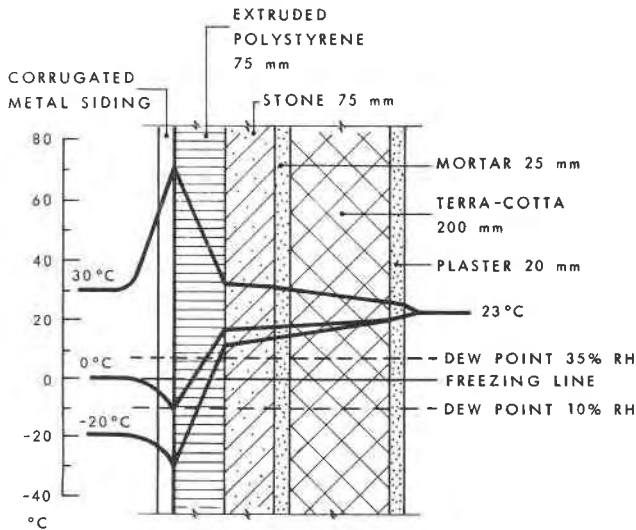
Thermal gradients, winter and summer conditions, for masonry wall insulated on outside.
